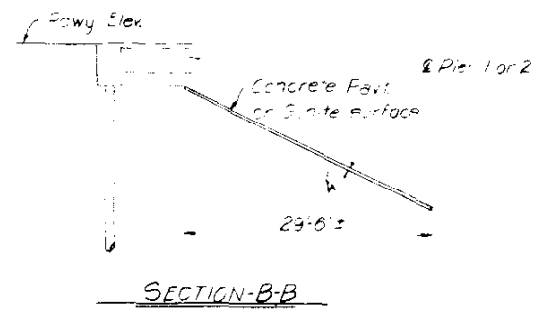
DETAIL AT ABUTMENT - (TYPICAL AT ABUTMENT #2)
